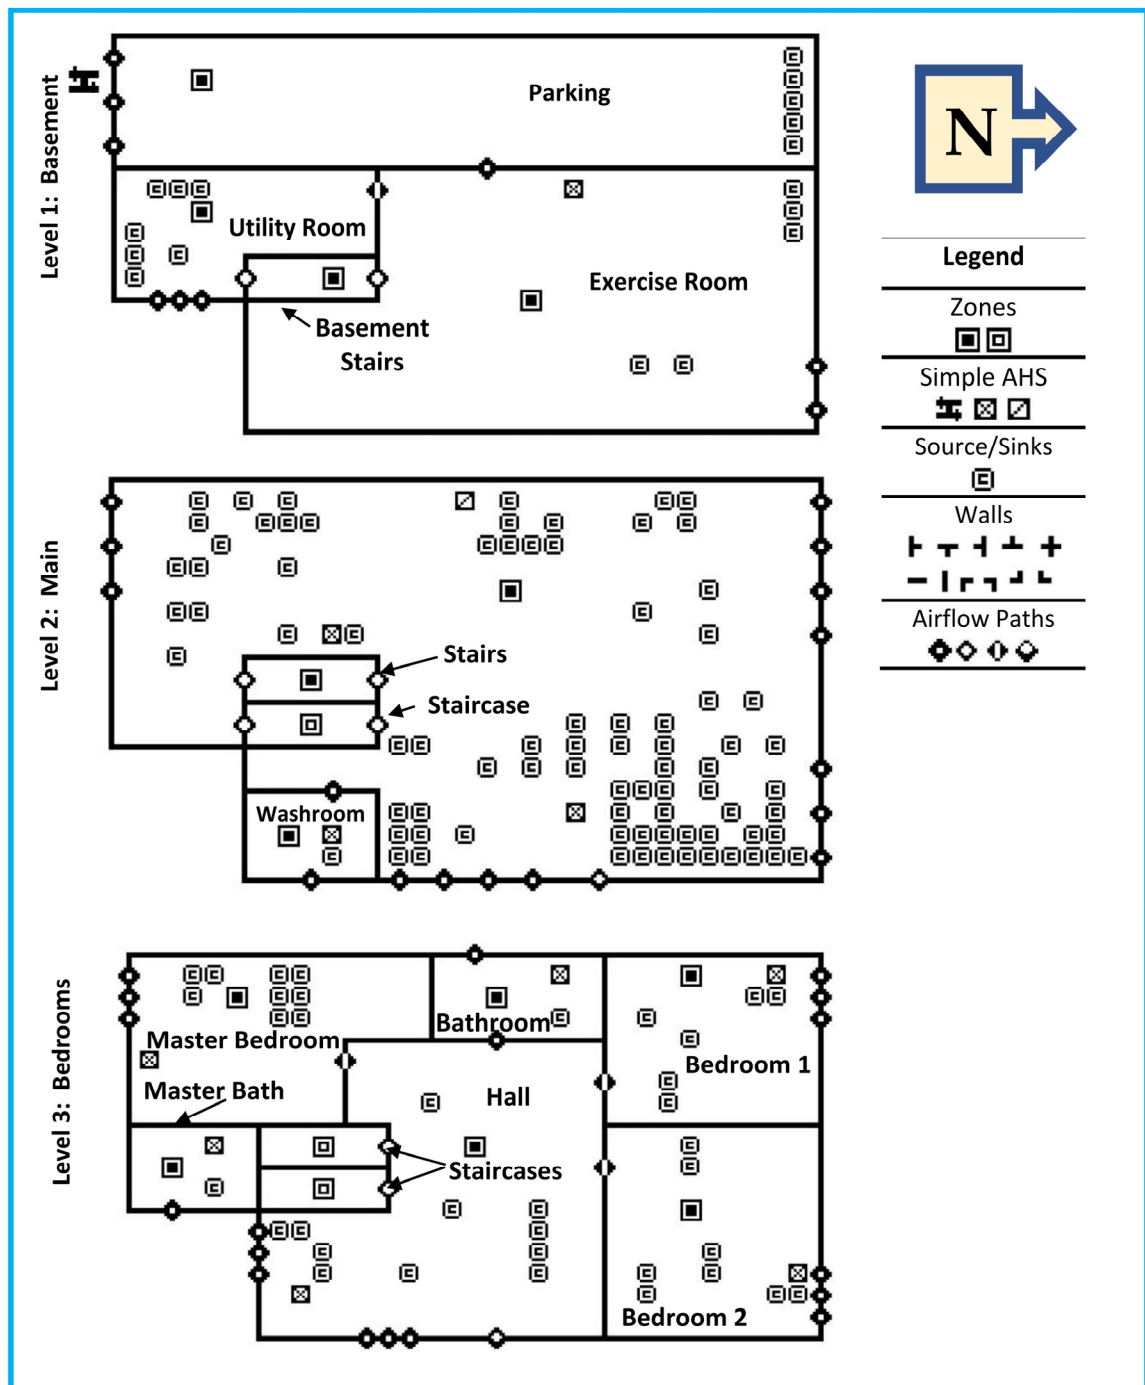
Floor plans of basement level (utility room, exercise room, parking, and staircases), main level (living room, kitchen, washroom, and staircases), and bedrooms level (three bedrooms, two bathrooms, hall, and staircases), with locations of zones, AHS (air-handling system), source and sinks of contaminants, walls, and airflow paths for three-story house created by CONTAM
